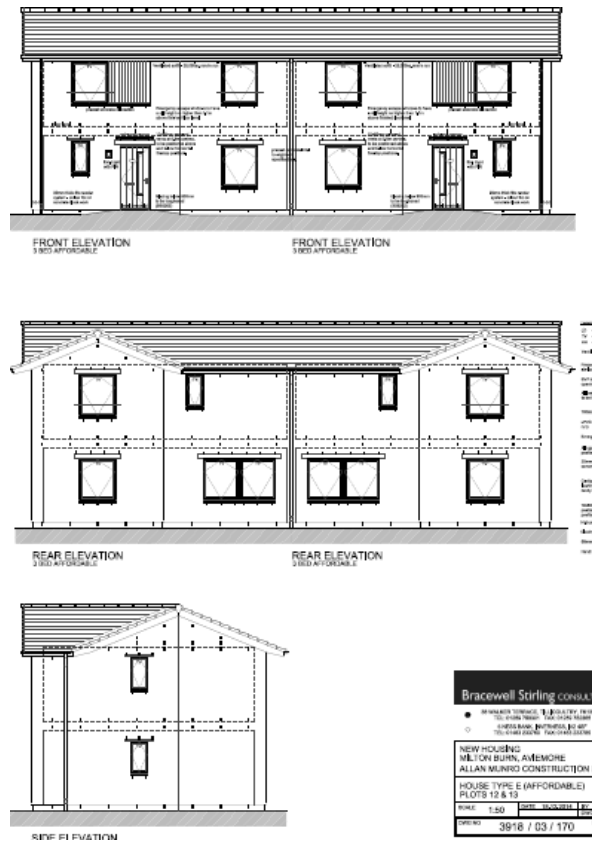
(a): Proposed House Type on plots 12 and 13 (Extract from Applicant's drawing 3918/03/170 for information only)
